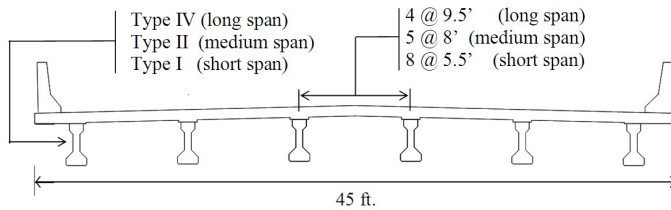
Medium Span AASHTO Beam Bridge Cross-Section
